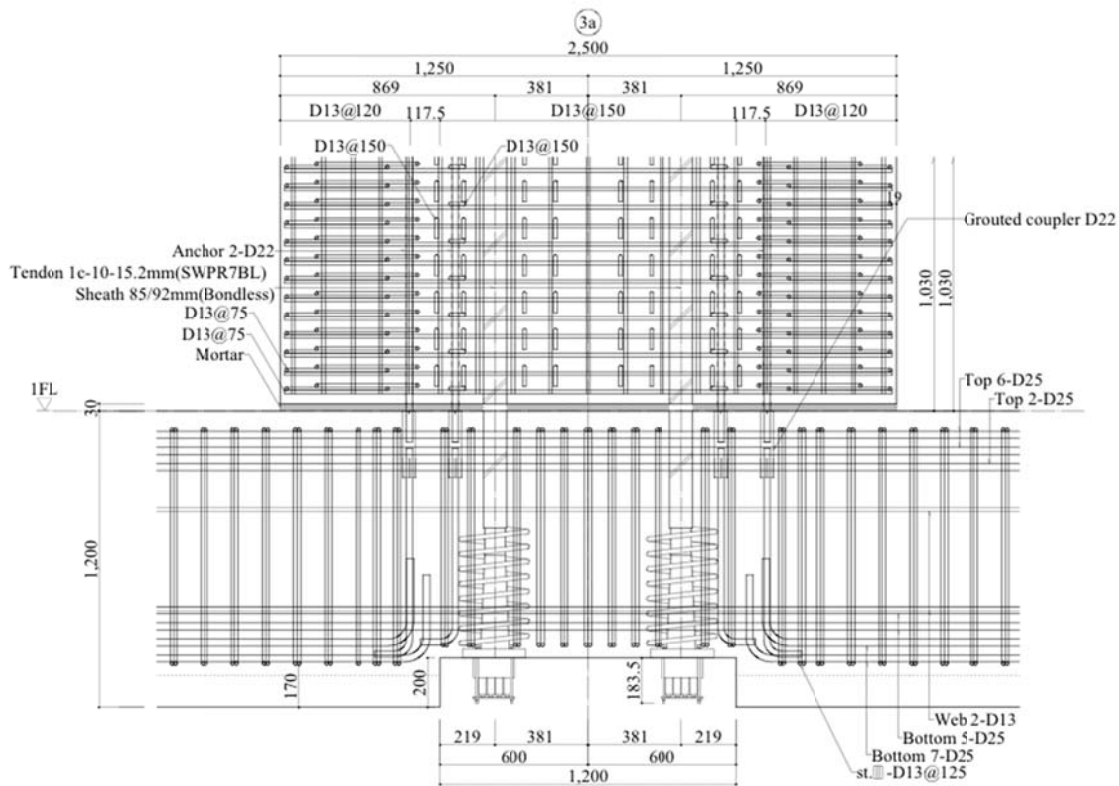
Reinforcement details of wall base (Unit: mm)
